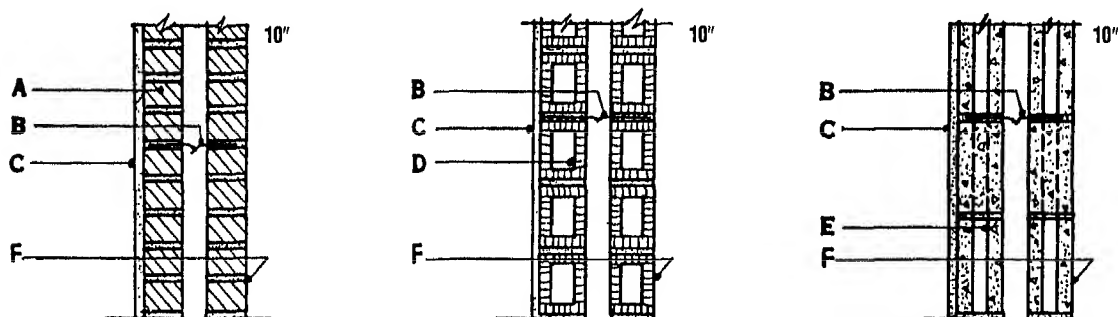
Cavity type; bearing (sections). A=clay brick, B=corrosion-resistant metal ties spaced to provide one tie to each 3 ft<sup>2</sup> of wall surface, C=gypsum plaster, D=structural clay load-bearing tile, E=concrete masonry units of load-bearing grade, F=exterior face of wall.
